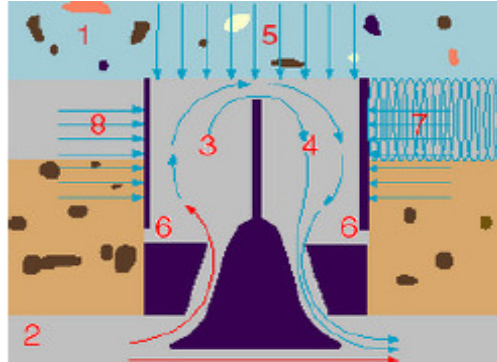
Cavity wall Schrijver damp proofing system [60]
